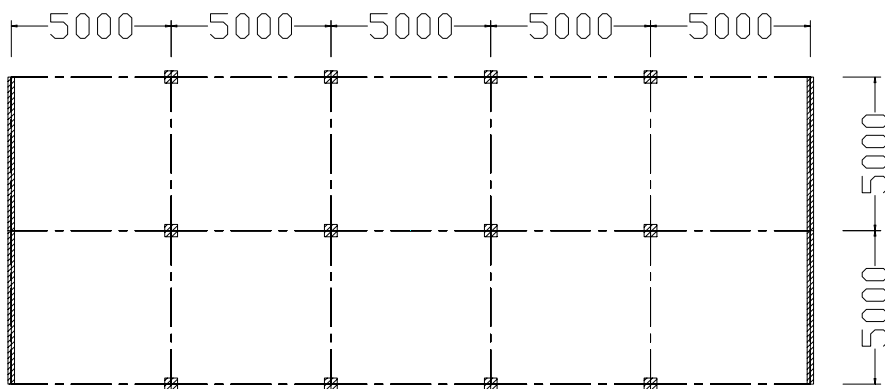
Sample building structure used for this study (dimension is in mm)
